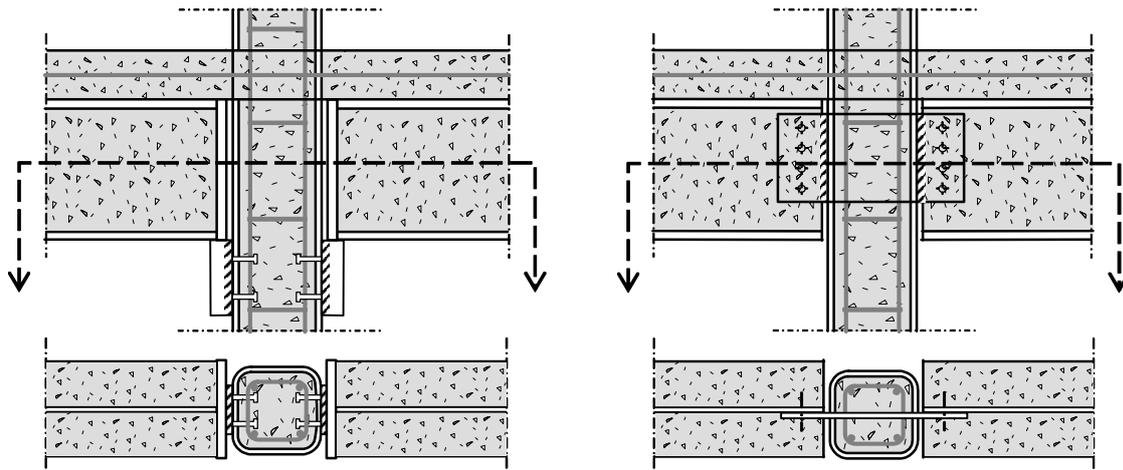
Connections between composite beams and concrete-filled hollow-section column.
